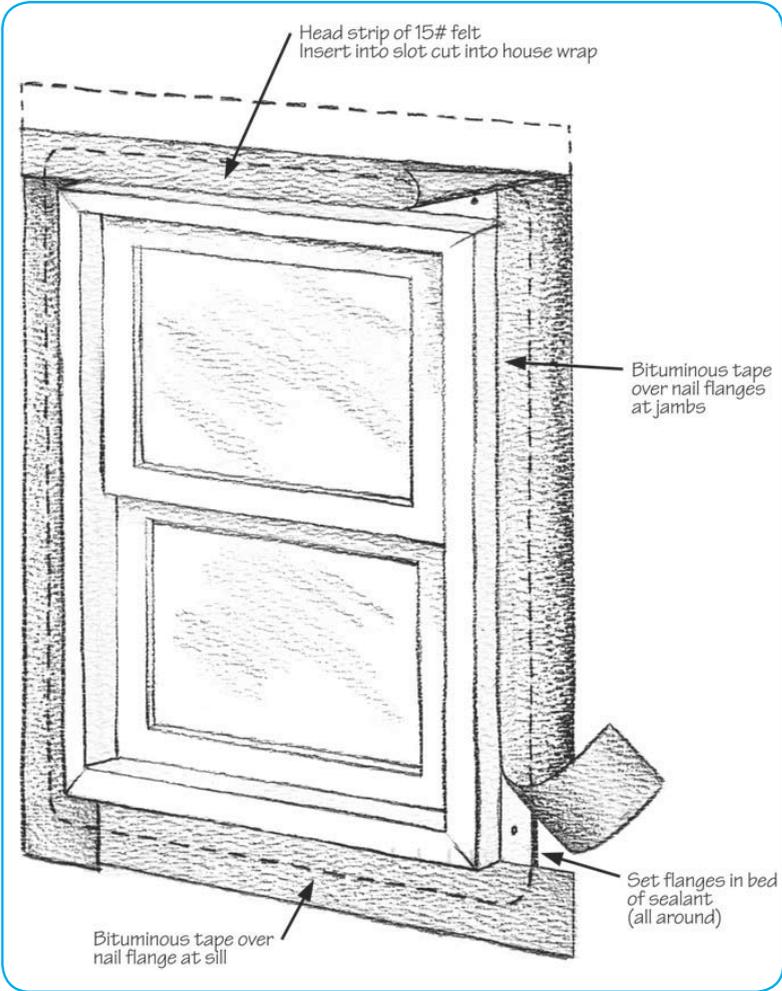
Window Flashing Illustration (building wrap installed prior to window; typical nail flange installation)
